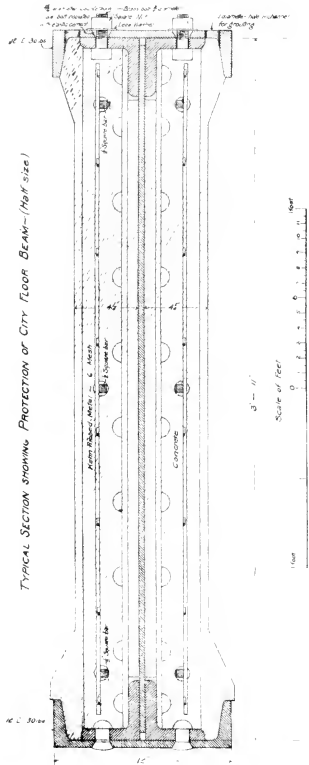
BOYLSTON STREET BRIDGE DRAWING SHOWING CONCRETE PROTECTION OF FLOOR BEAMS
